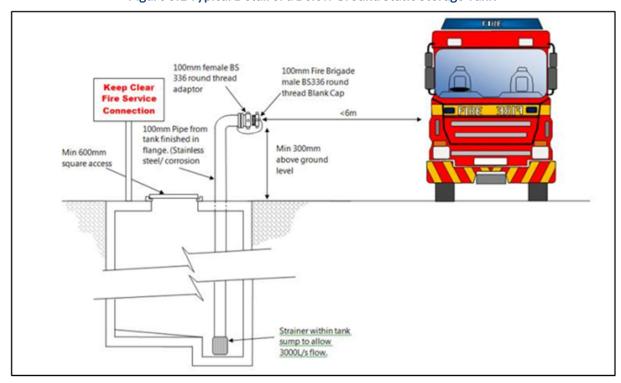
Typical Detail of a Below Ground Static Storage Tank
